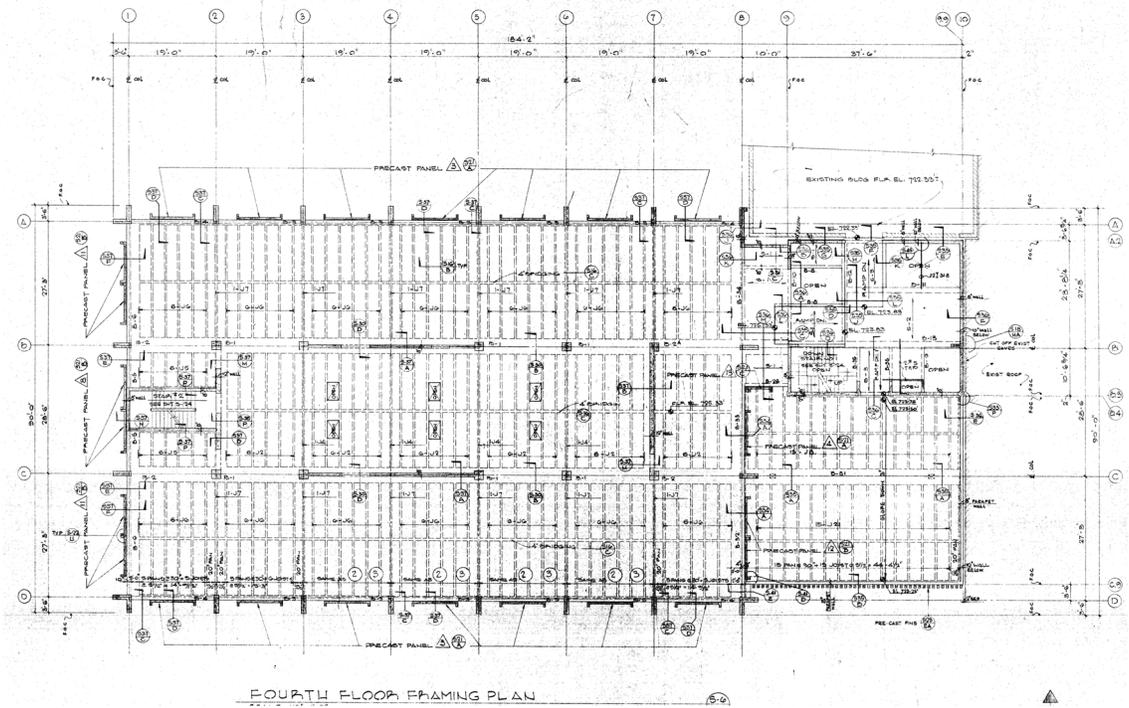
Structural floor plan of Level 4, by Frank L. Hope & Associates. Assumed north is up on plan.
